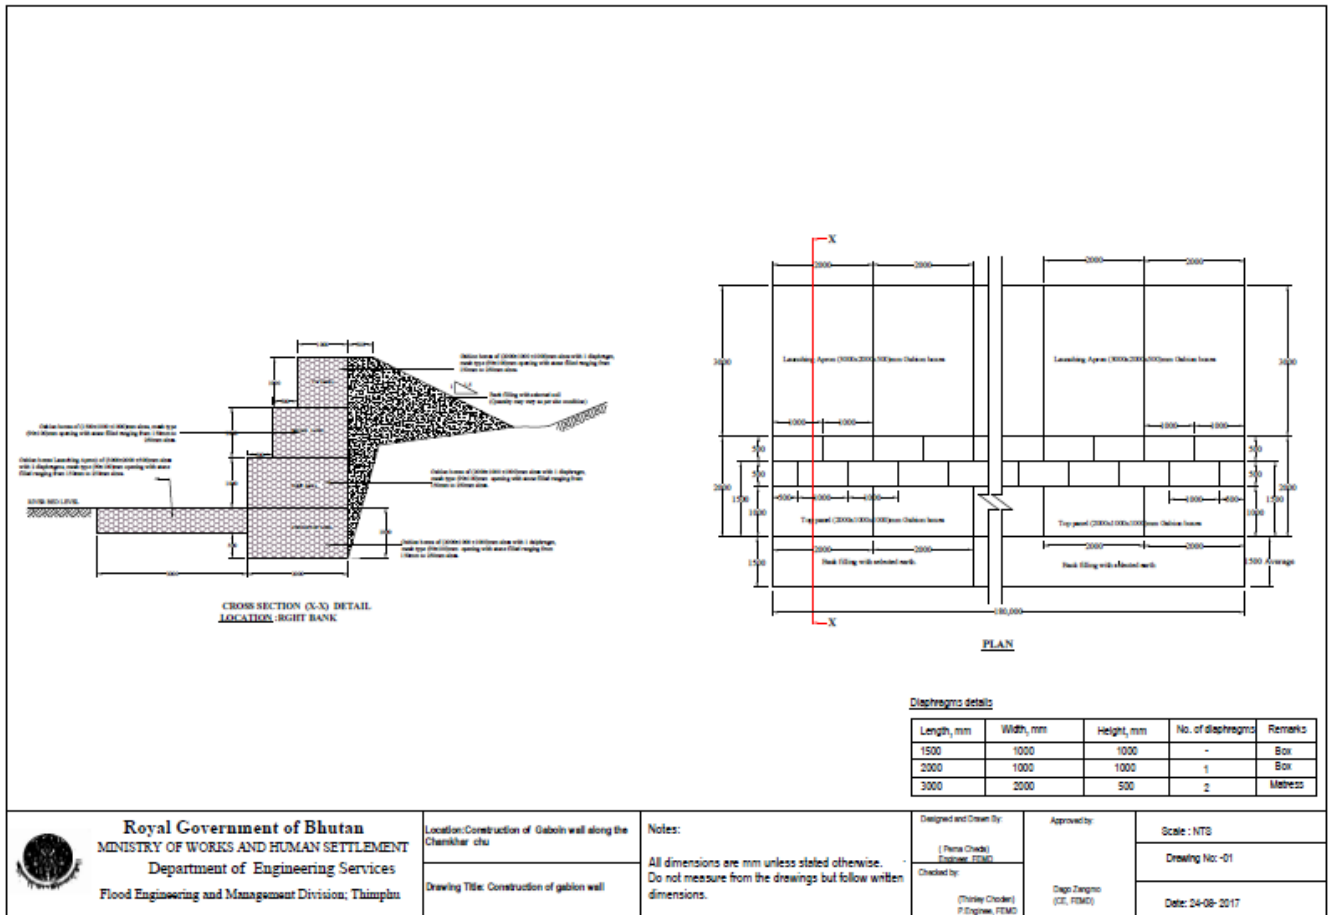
Plan and cross section of gabion wall along Chamkhar Chu.
